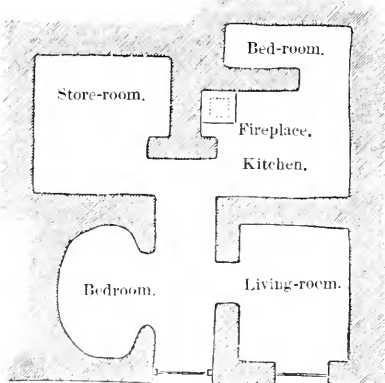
PLAN OF A CAVE DWELLING NEAR LANGENSTEIN.
